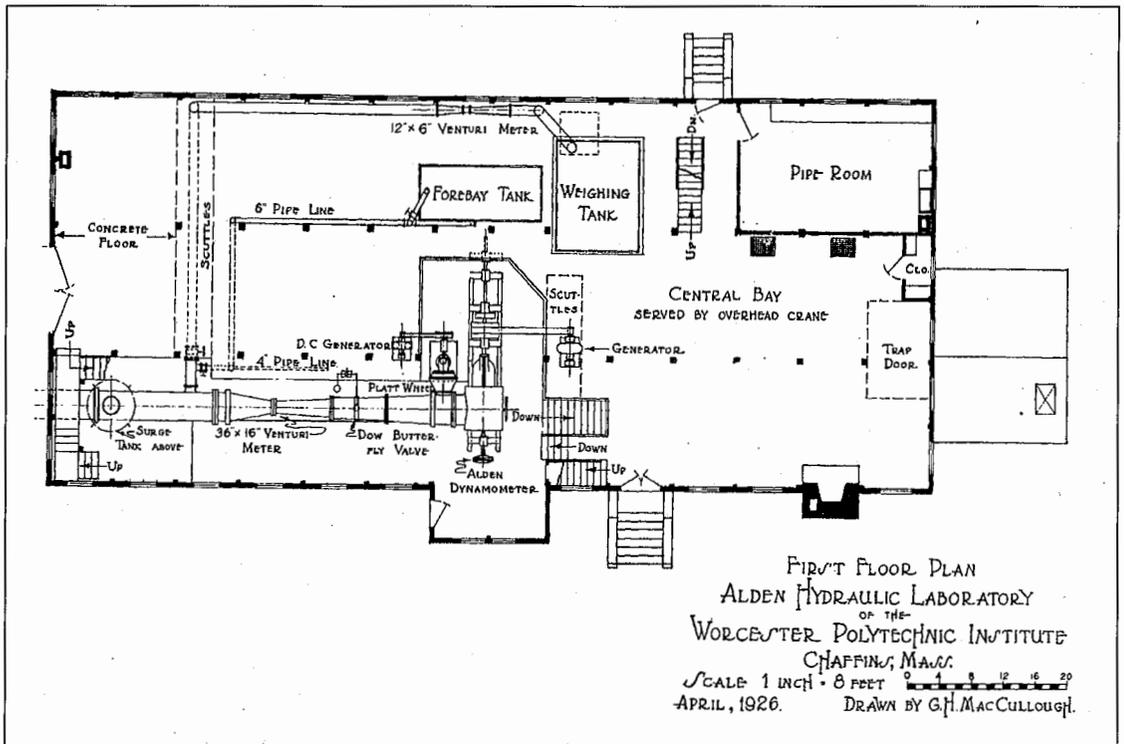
Layout of the first floor of the Alden Hydraulic Laboratory (1926).
